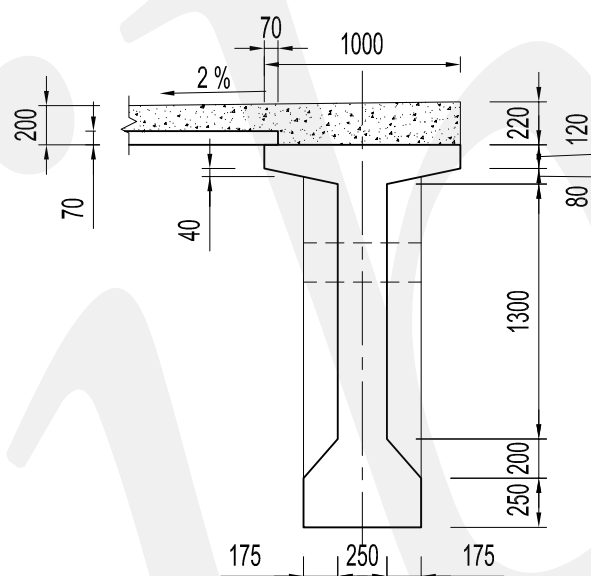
Cross-section dimensions of precast concrete girder. Note: All dimensions are in centimeters. 1 cm = 0.3937 in.
